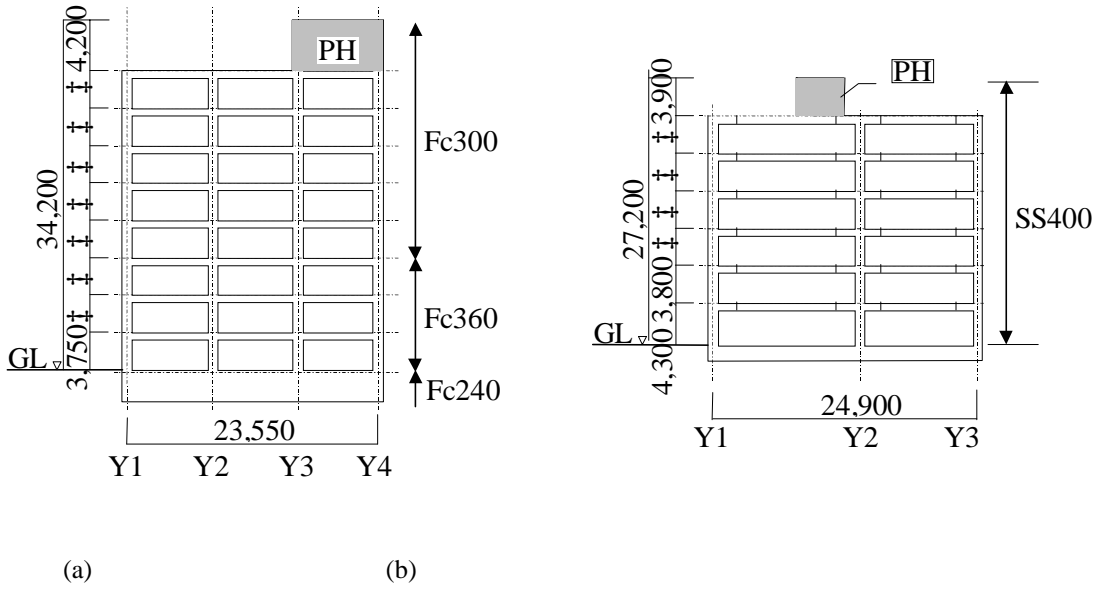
Building models: (a) reinforced concrete building; (b) steel building (unit: mm)
